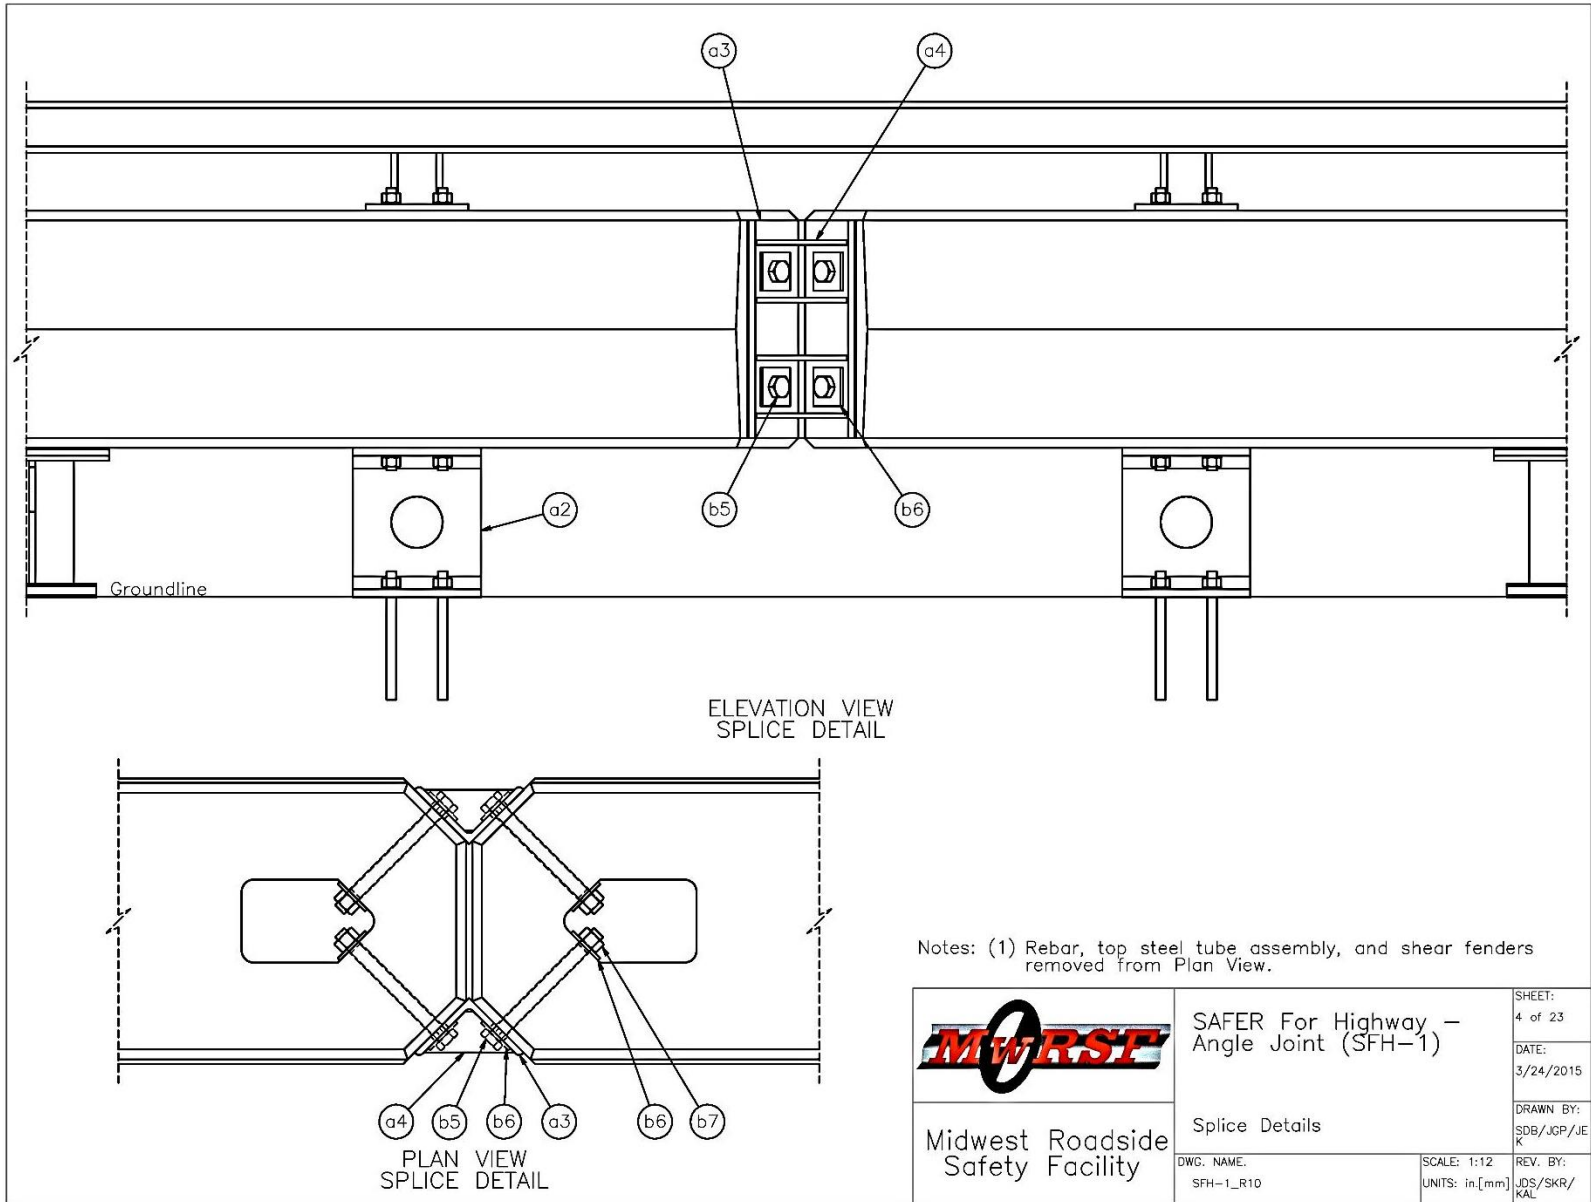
Splice Details, Test Nos. SFH-1 and SFH-2
